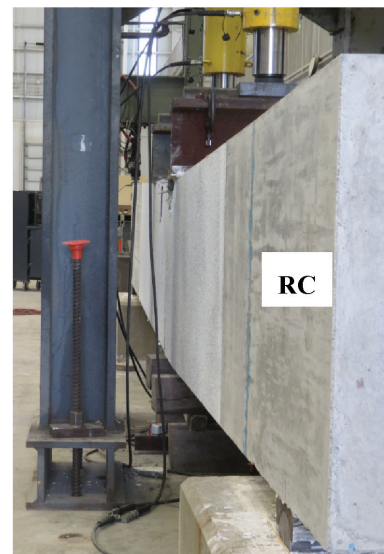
Concrete crack pattern (east side)—specimen OOPM-DN.
